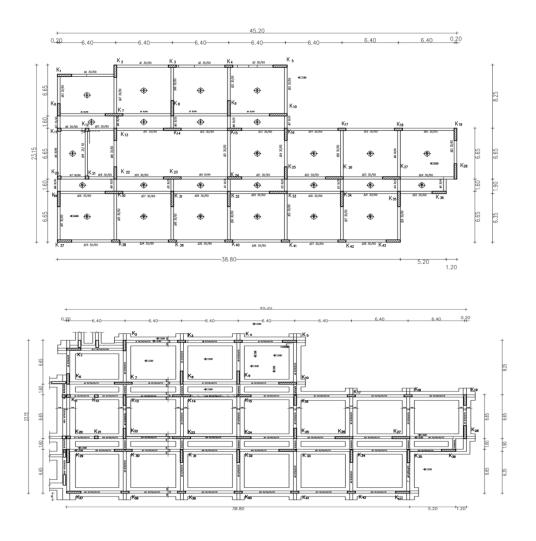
Formwork of the basement and ground floors (top) and of strip foundation (bottom)
